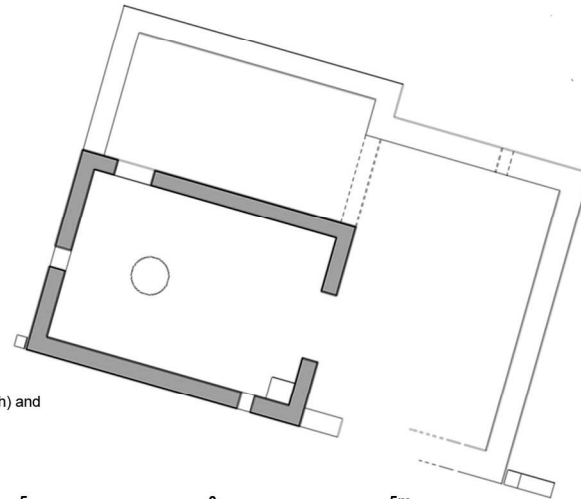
Plan of Lusthof Outbuilding on a scale of 1:200
